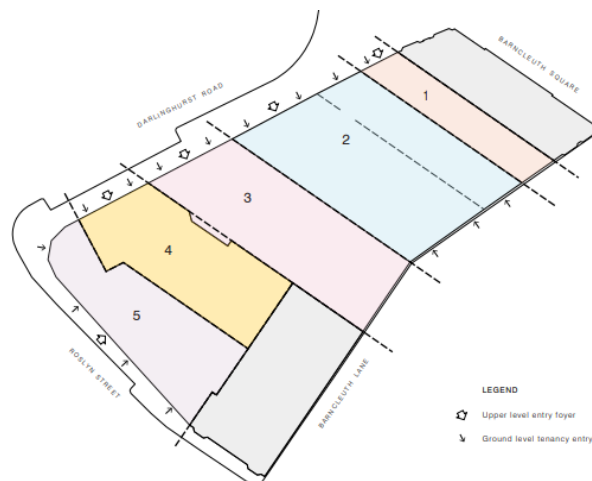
Site specific DCP control outlining how the block is to be composed of distinct building forms
